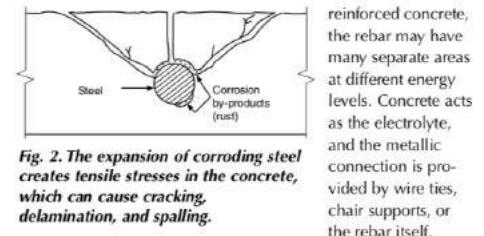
The expansion of corroding steel creates tensile stresses in the concrete, which can cause cracking, delamination, and spalling.
